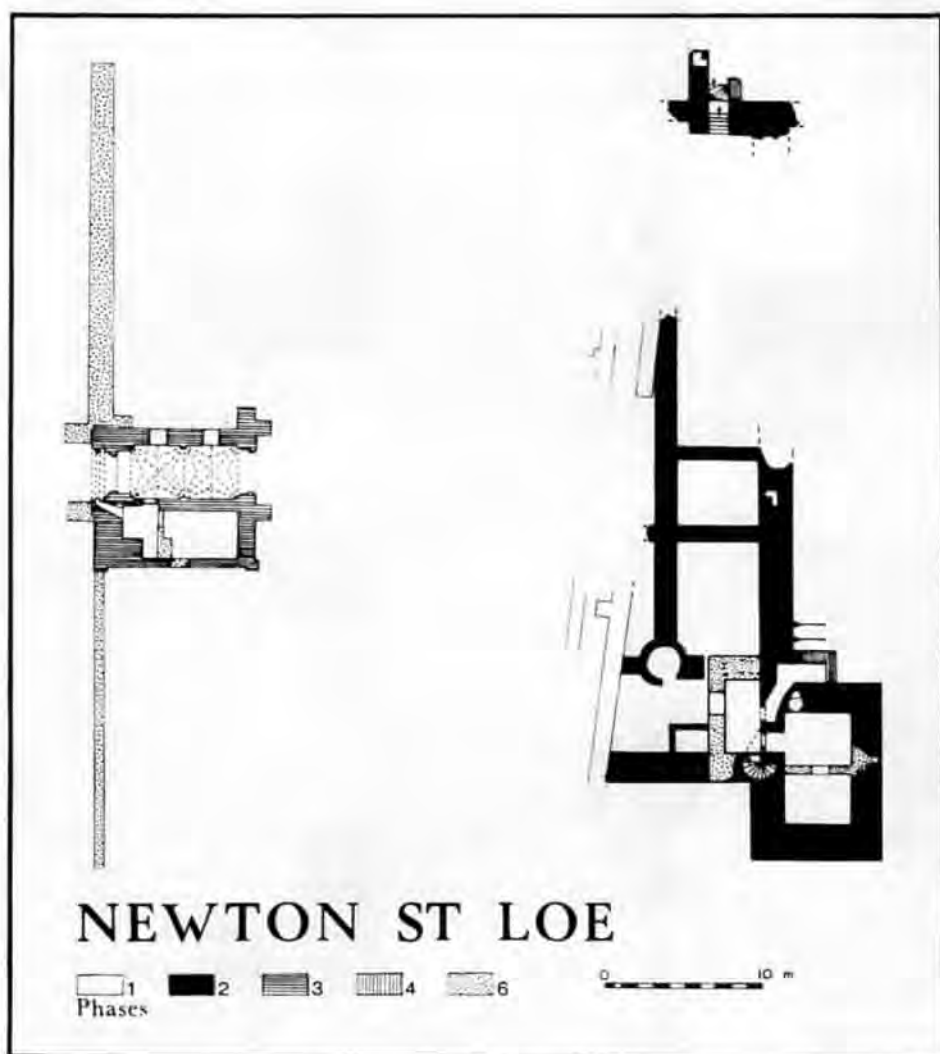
Newton St. Loë: plan of the excavated and standing structures.
